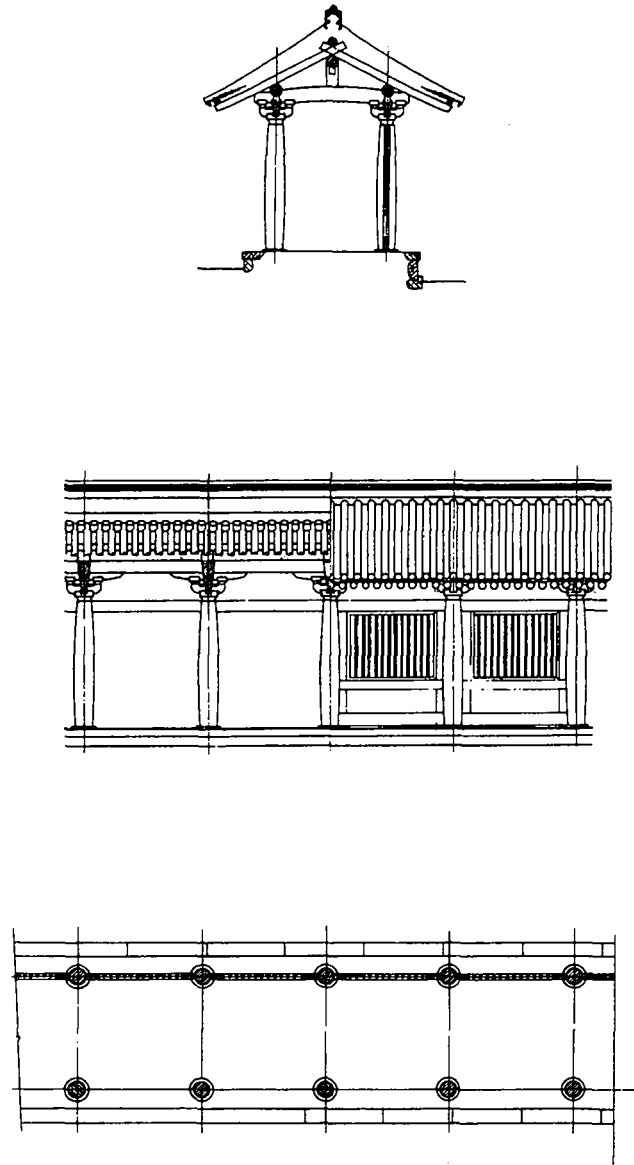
Reconstructed plan, elevation and sections of the rear galleries of Güm-gang-sa
